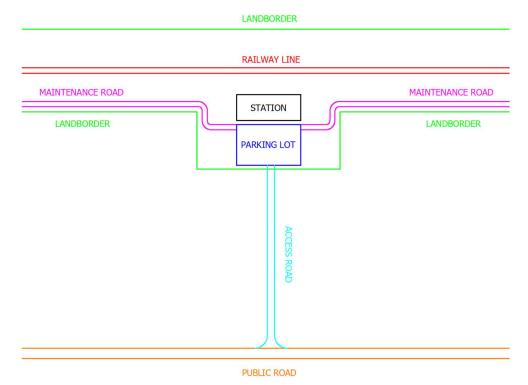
RECOMMENDED PRINCIPAL ROAD SCHEME FOR STATION AND PARKING LOT
